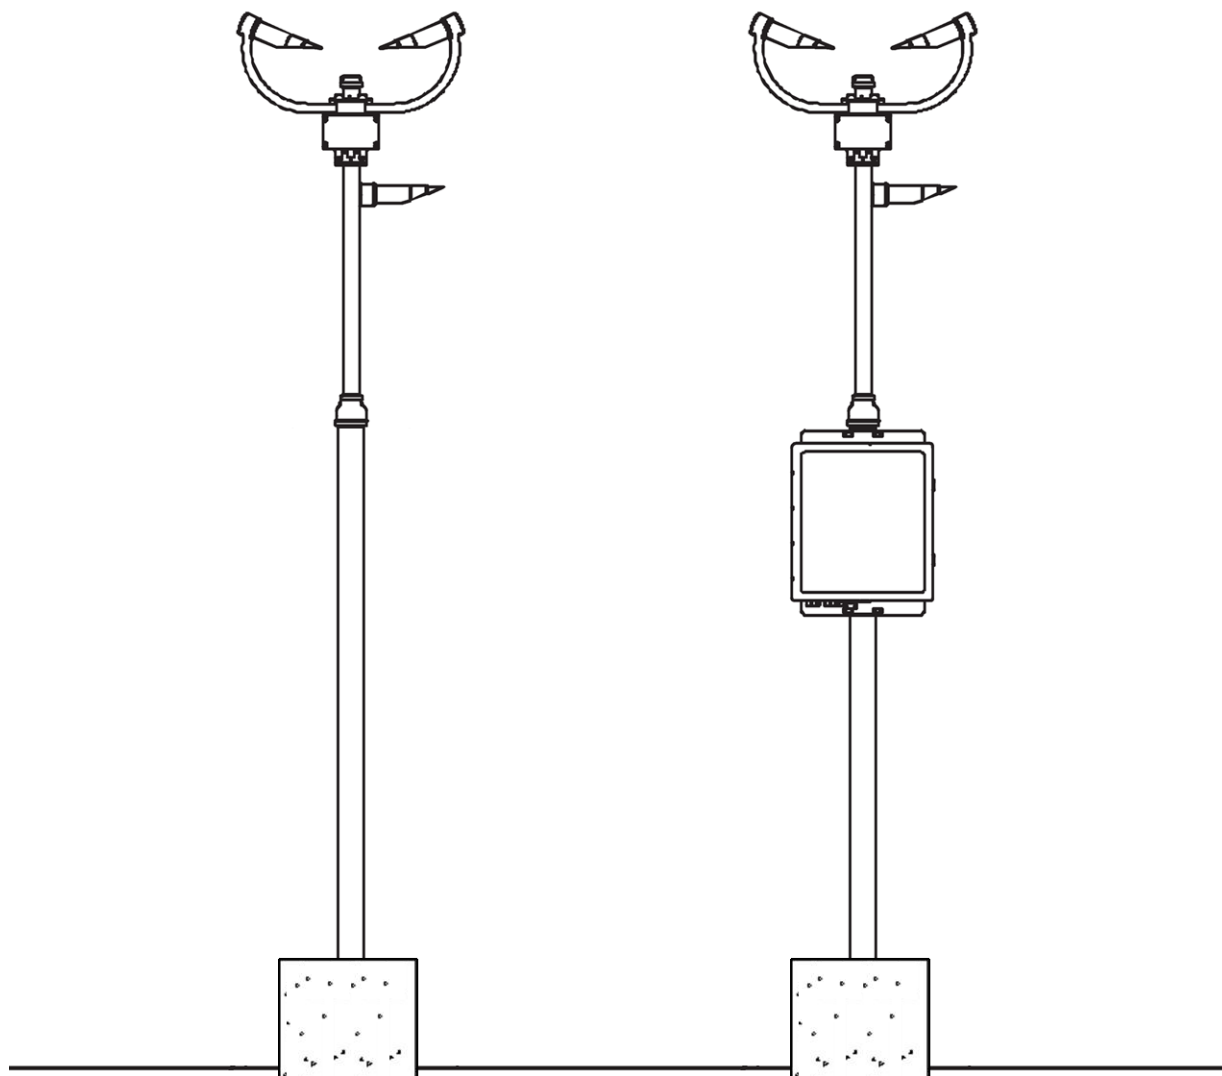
Sensor Conduit and Electrical Junction Box Installation for Direct Connect Sensors
